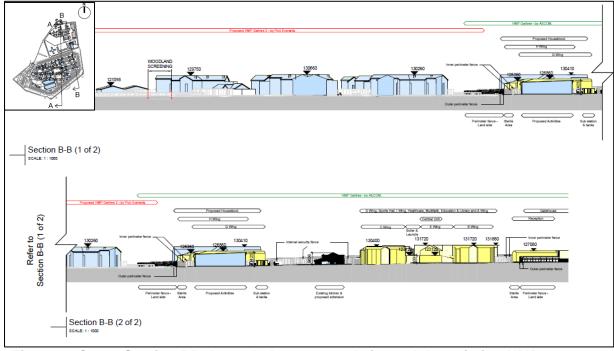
Cross Section BB through the proposed site and the existing HMP Gartree submitted with 21/01600/OUT
